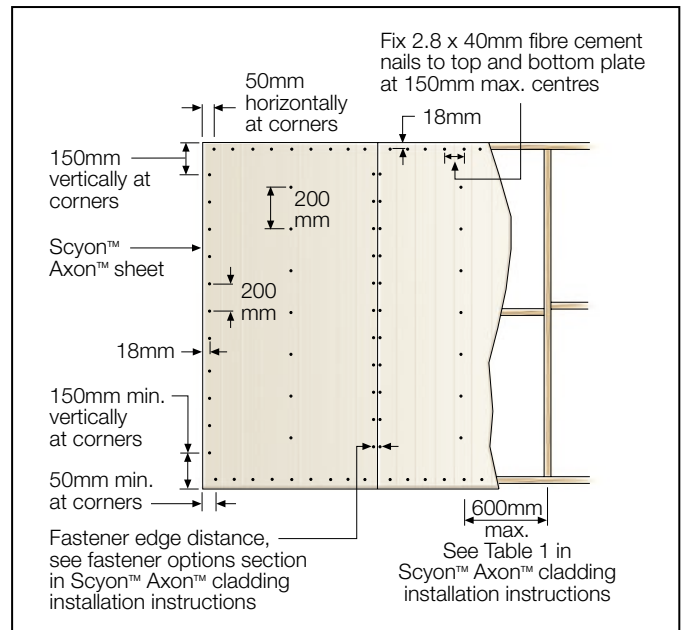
FIXING METHOD 1 FASTENER LAYOUT
